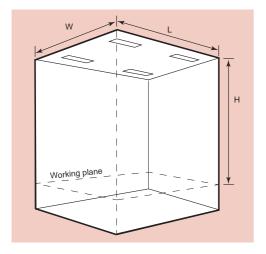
Room index dimensions (Note: When luminaires are suspended below the ceiling, then H is the dimension between the plane of the luminaires and the working plane)
